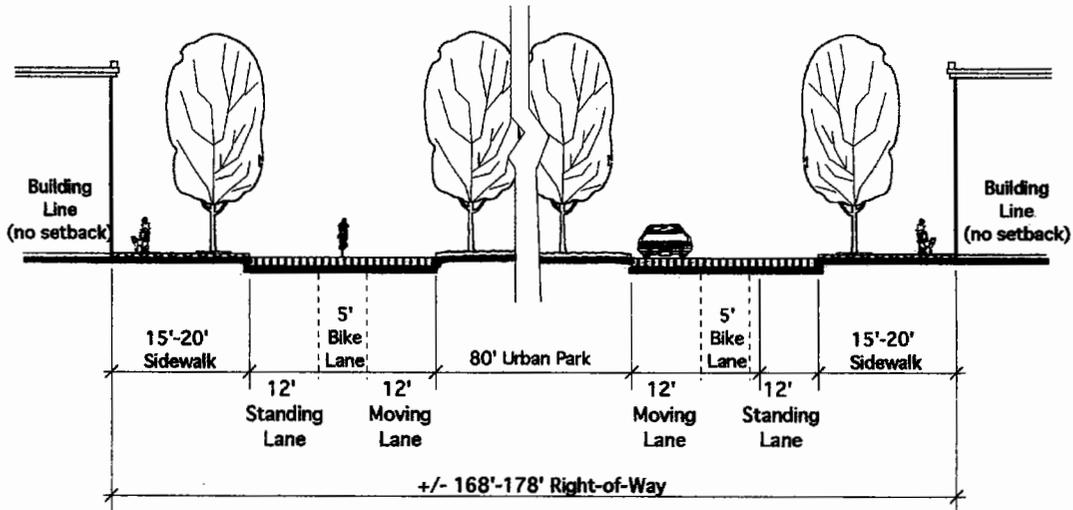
shows the cross-section of a typical segment of the new Main Street, with two moving and two standing lanes, bike lanes and sidewalks of 15-20 feet in width.
